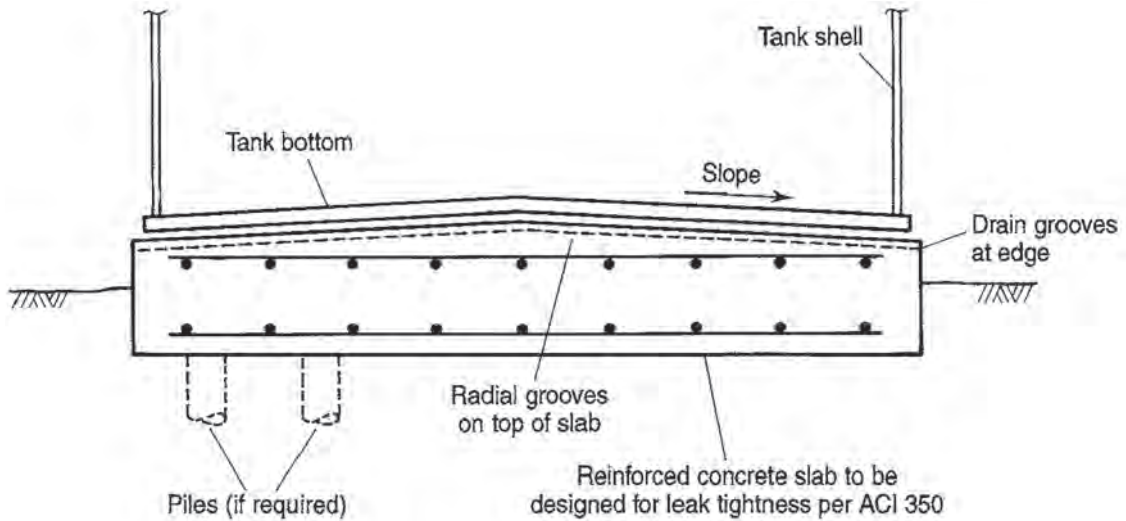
Reinforced concrete slab with radial grooves for leak detection (from API, 2005)
